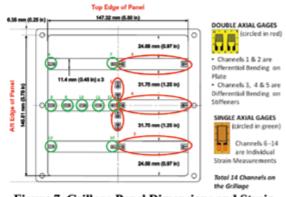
Grillage Panel Dimensions and Strain Gage Arrangement
